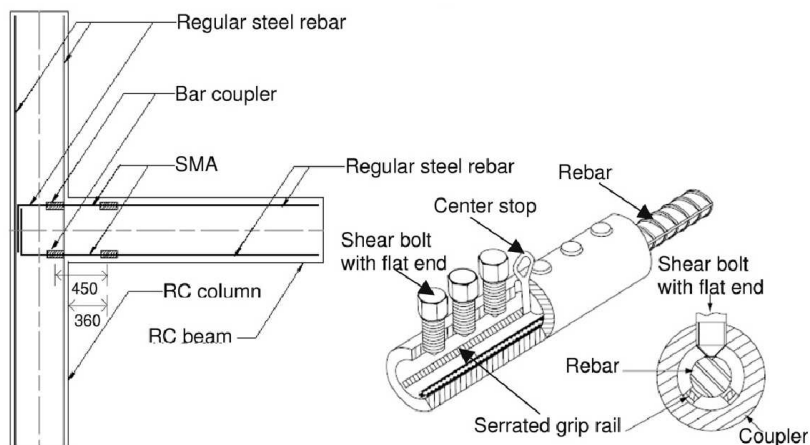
Reinforcement details of beam-column element with coupler (dimensions in mm) (adapted from Alam *et al.* [5]).
